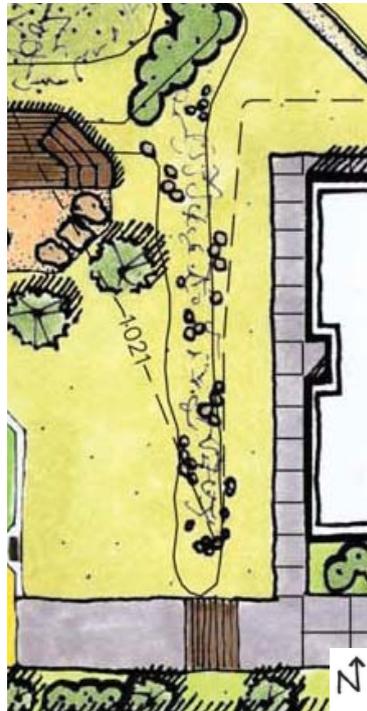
Enlarged Plan of West Side Drainage Creek Bed. Not to Scale. Plan by Author
